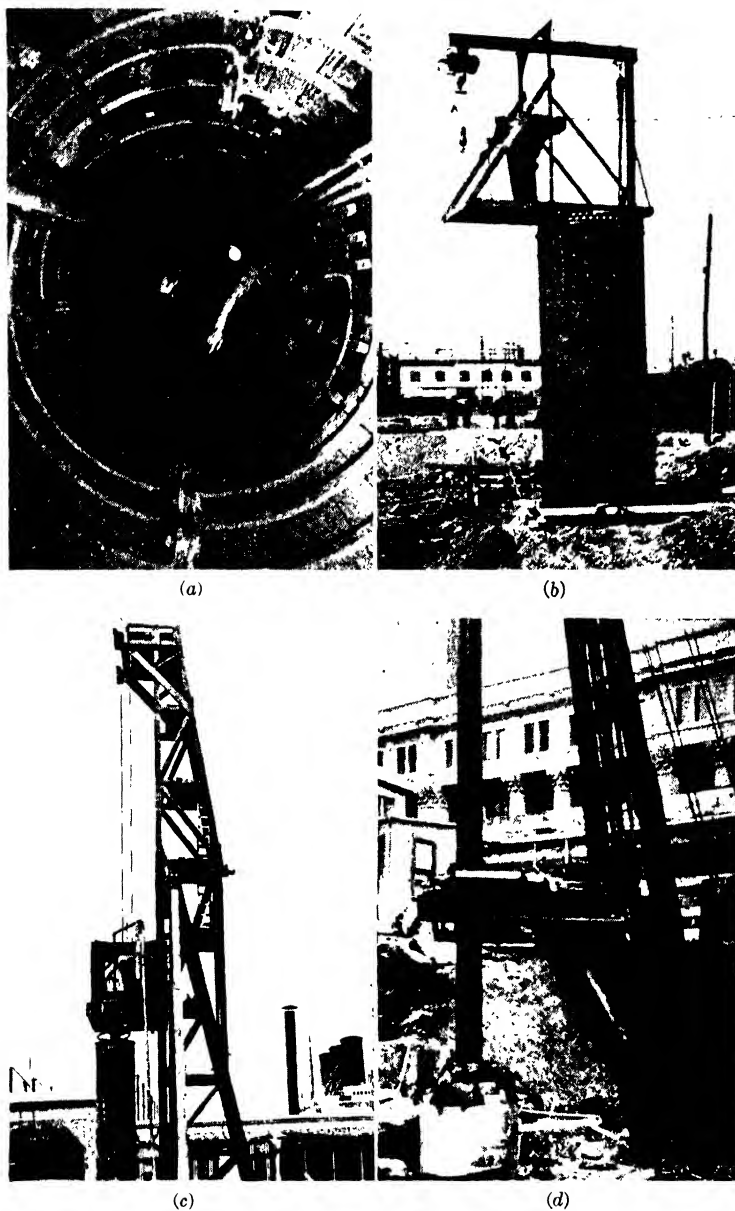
(a) Chicago-type well shaft; (b) open steel cylinder caisson; (c) spinning steel caisson under pressure; (d) large earth auger.
